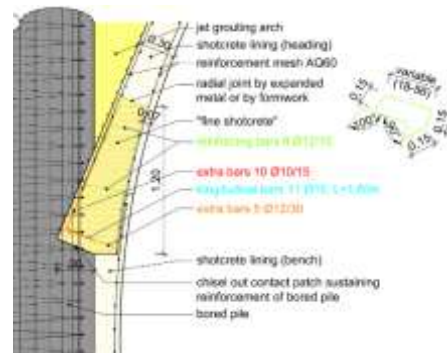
Detail of the notch in the bored pile to support the primary lining
